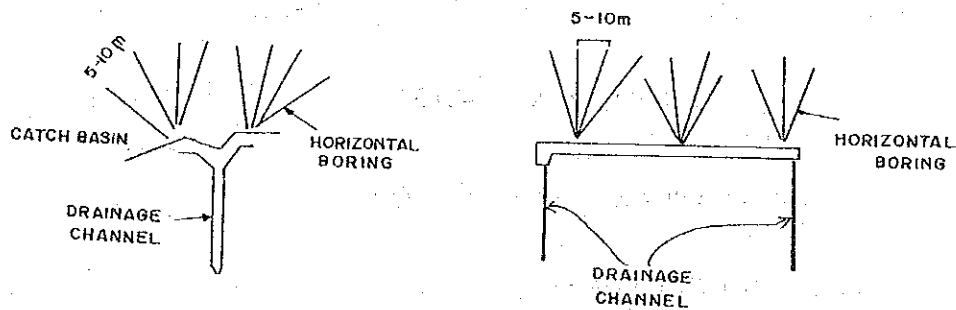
LOCATION OF BORING FOR HORIZONTAL DRAIN HOLE
